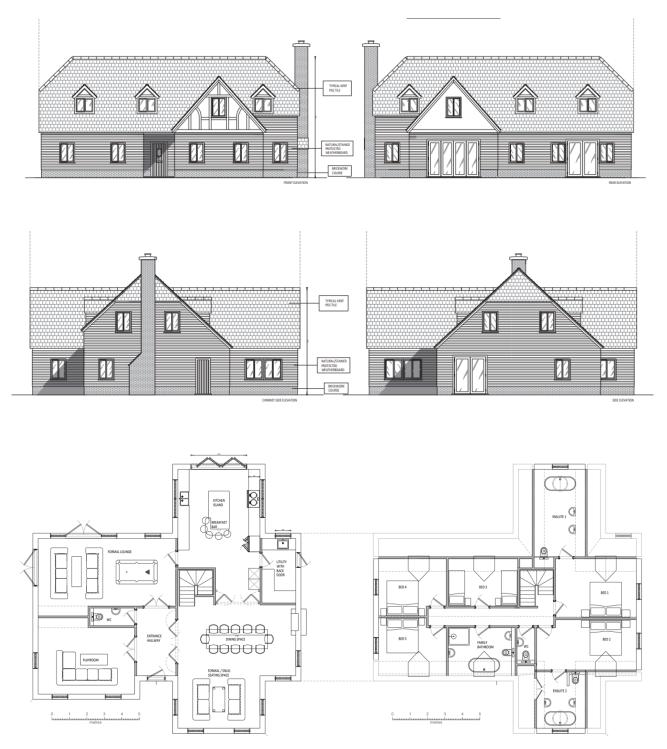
Proposed Elevations and Floor Plans for 'The Cottage'
